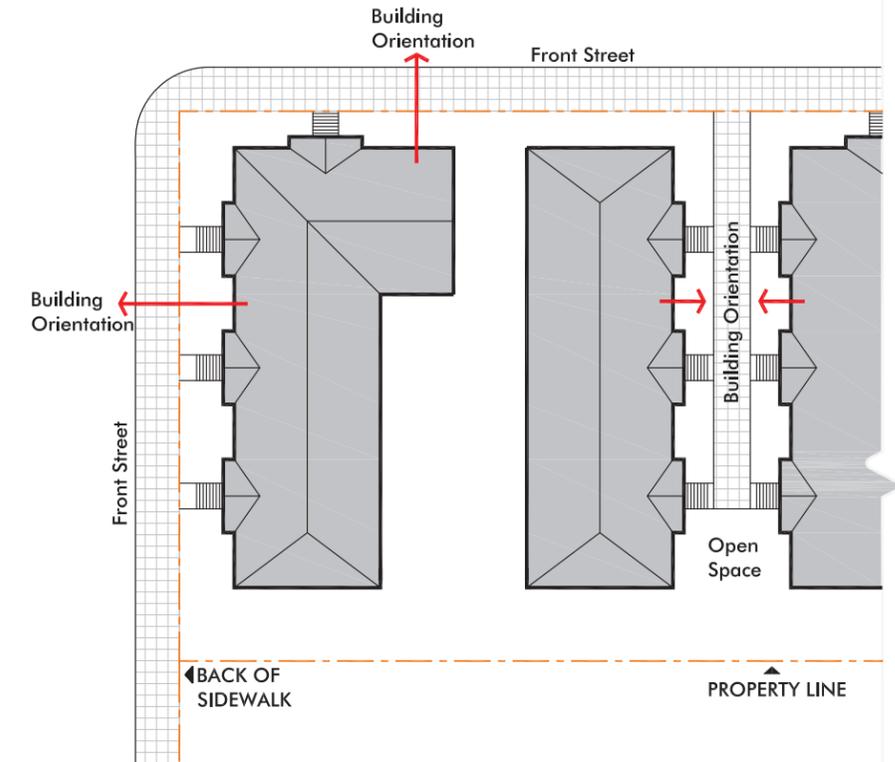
Building Orientation to Streets and Public Open Spaces
